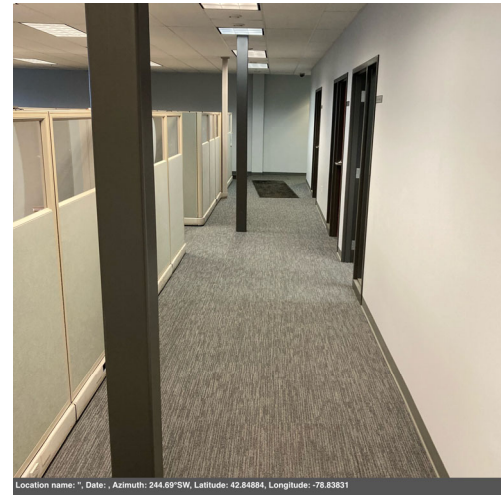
Carpeting placed over office linoleum hallway (March 2024)
